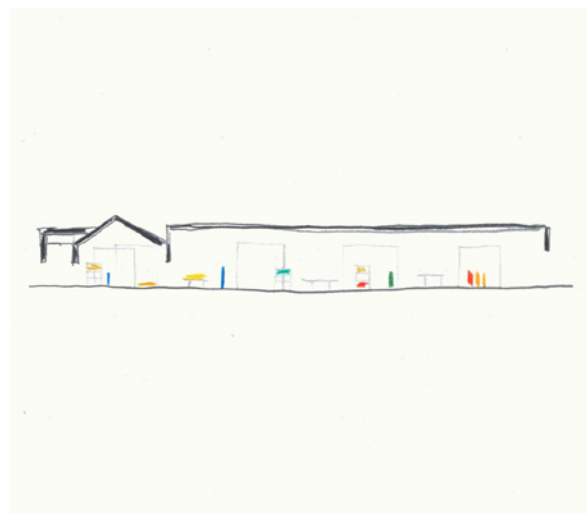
Section sketch of the new layout - the rooms work as an open space for constant flow of ideas and layouts;
